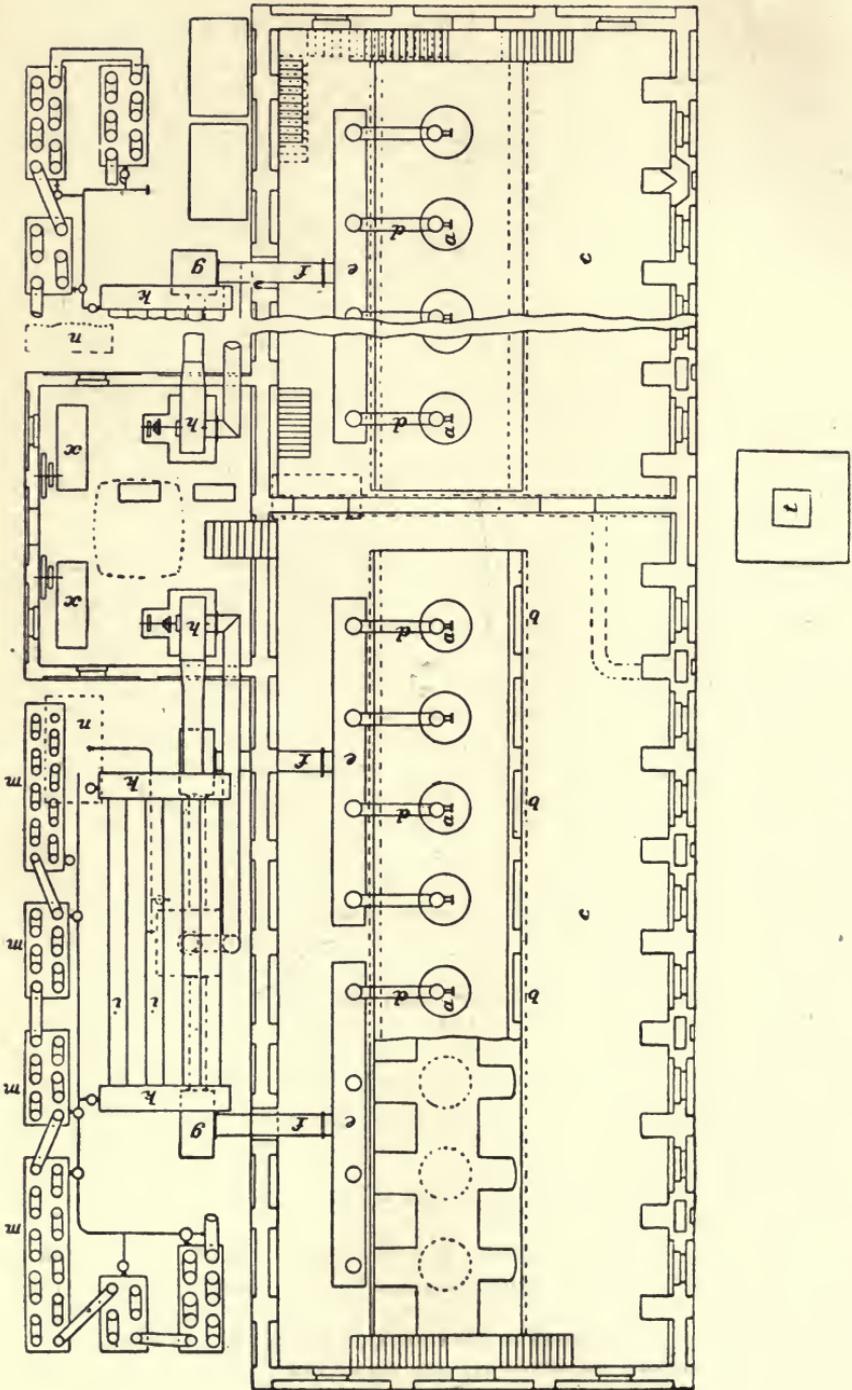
Dry-distillation plant. Plan and horizontal section.
